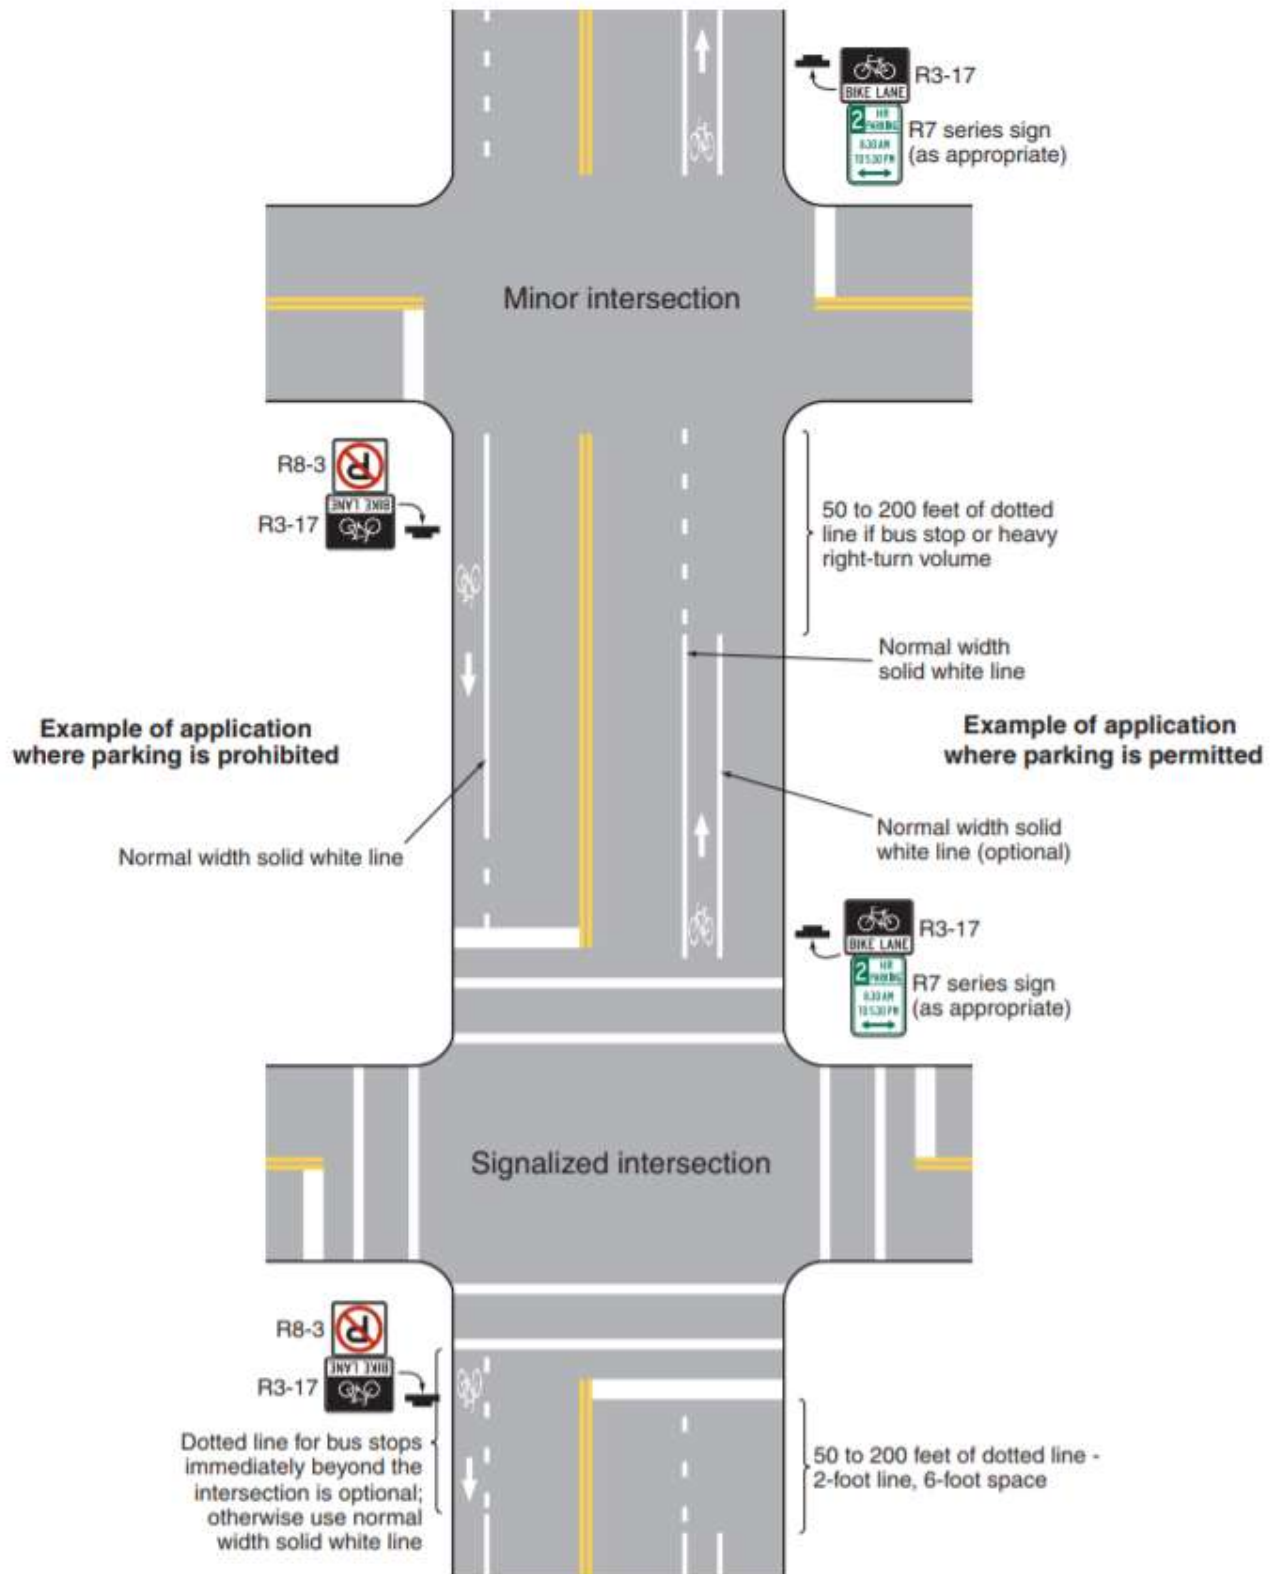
C-6. Example of Pavement Markings for Bicycle Lanes on a Two-Way Street
